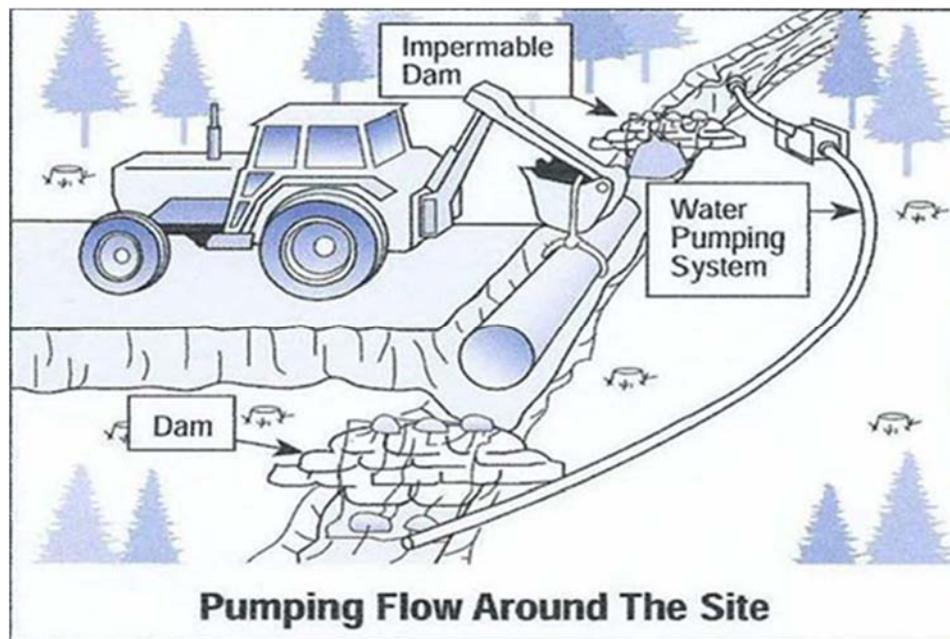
Typical Dam and Pump System for Streamflow Isolation During Culvert Installation
